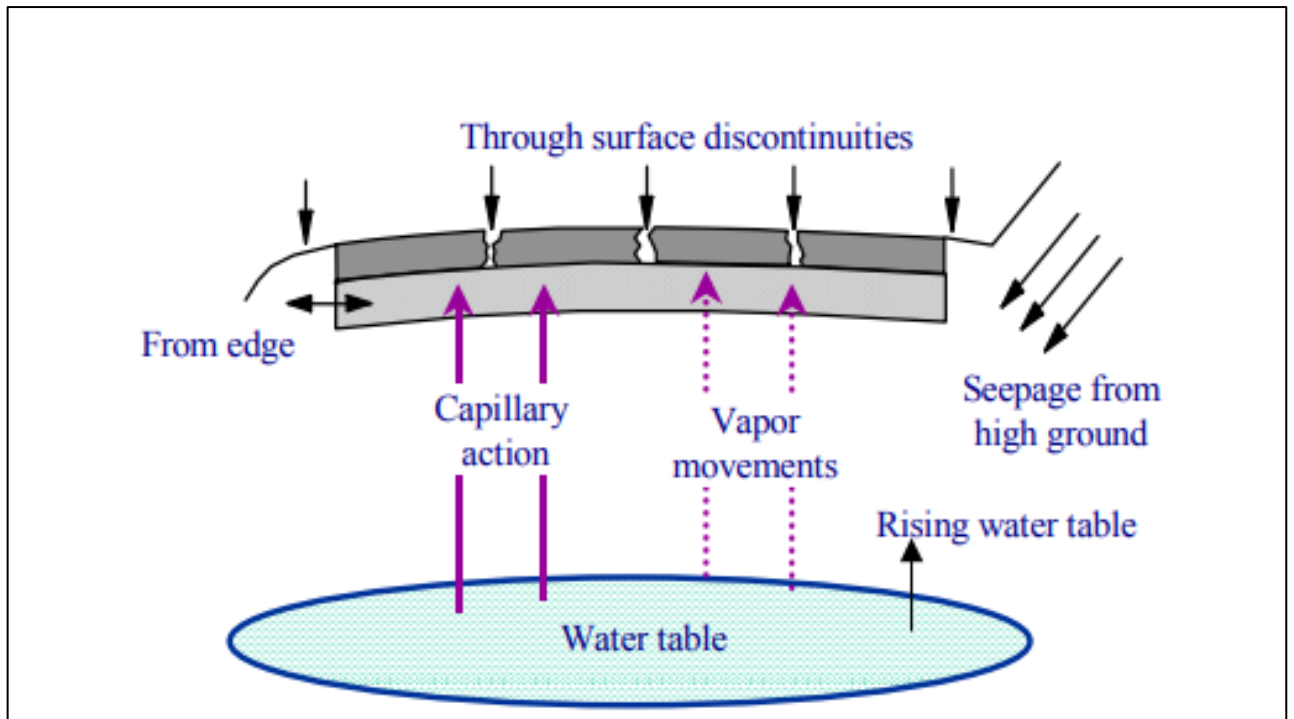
Sources of moisture for pavement structure (Look, 2007)
